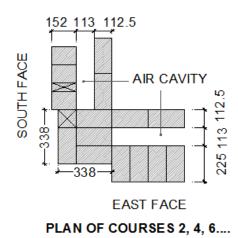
Plan of courses (Note: all dimensions are in mm)
